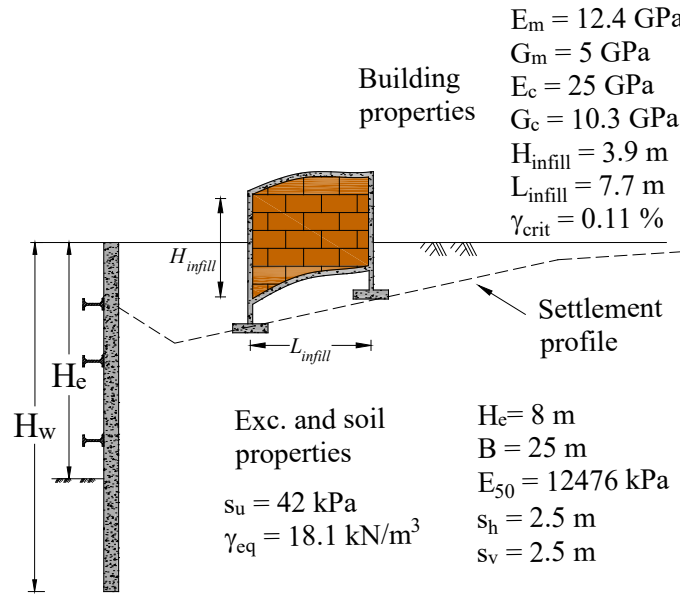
Excavation and adjacent building properties for the application of the methodology
